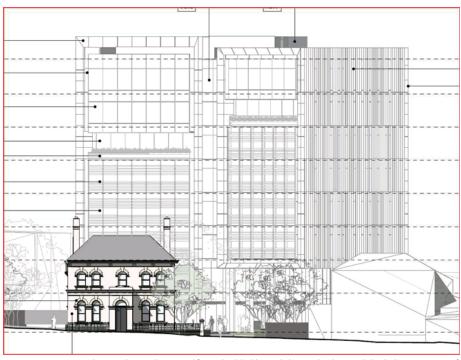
Queen Street elevation showing the restored former bank building with the new development behind. The arrangement of the new building on the site retains the prominence of the subject building and the former Post Office building adjacent to retain a strong streetscape presence. Source: FJMT Studio
